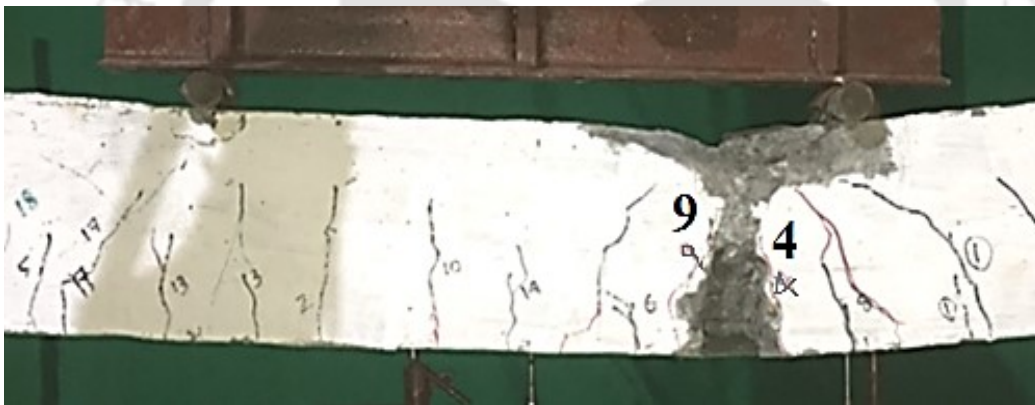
Enlarged view of cracks in PCM repaired beam, B1R.
